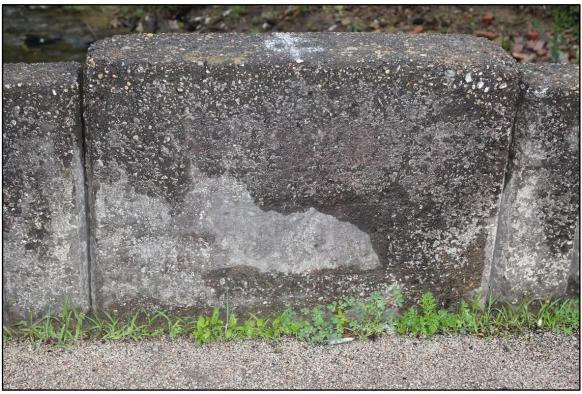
North Whites Addition Arch Bridge, (LG-0757), Facing Southwest
